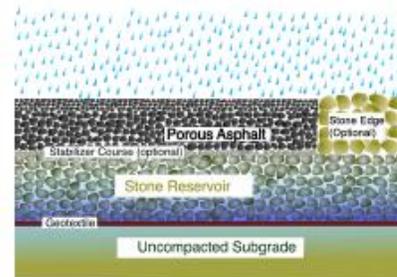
Typical porous asphalt pavement with stone reservoir cross section
